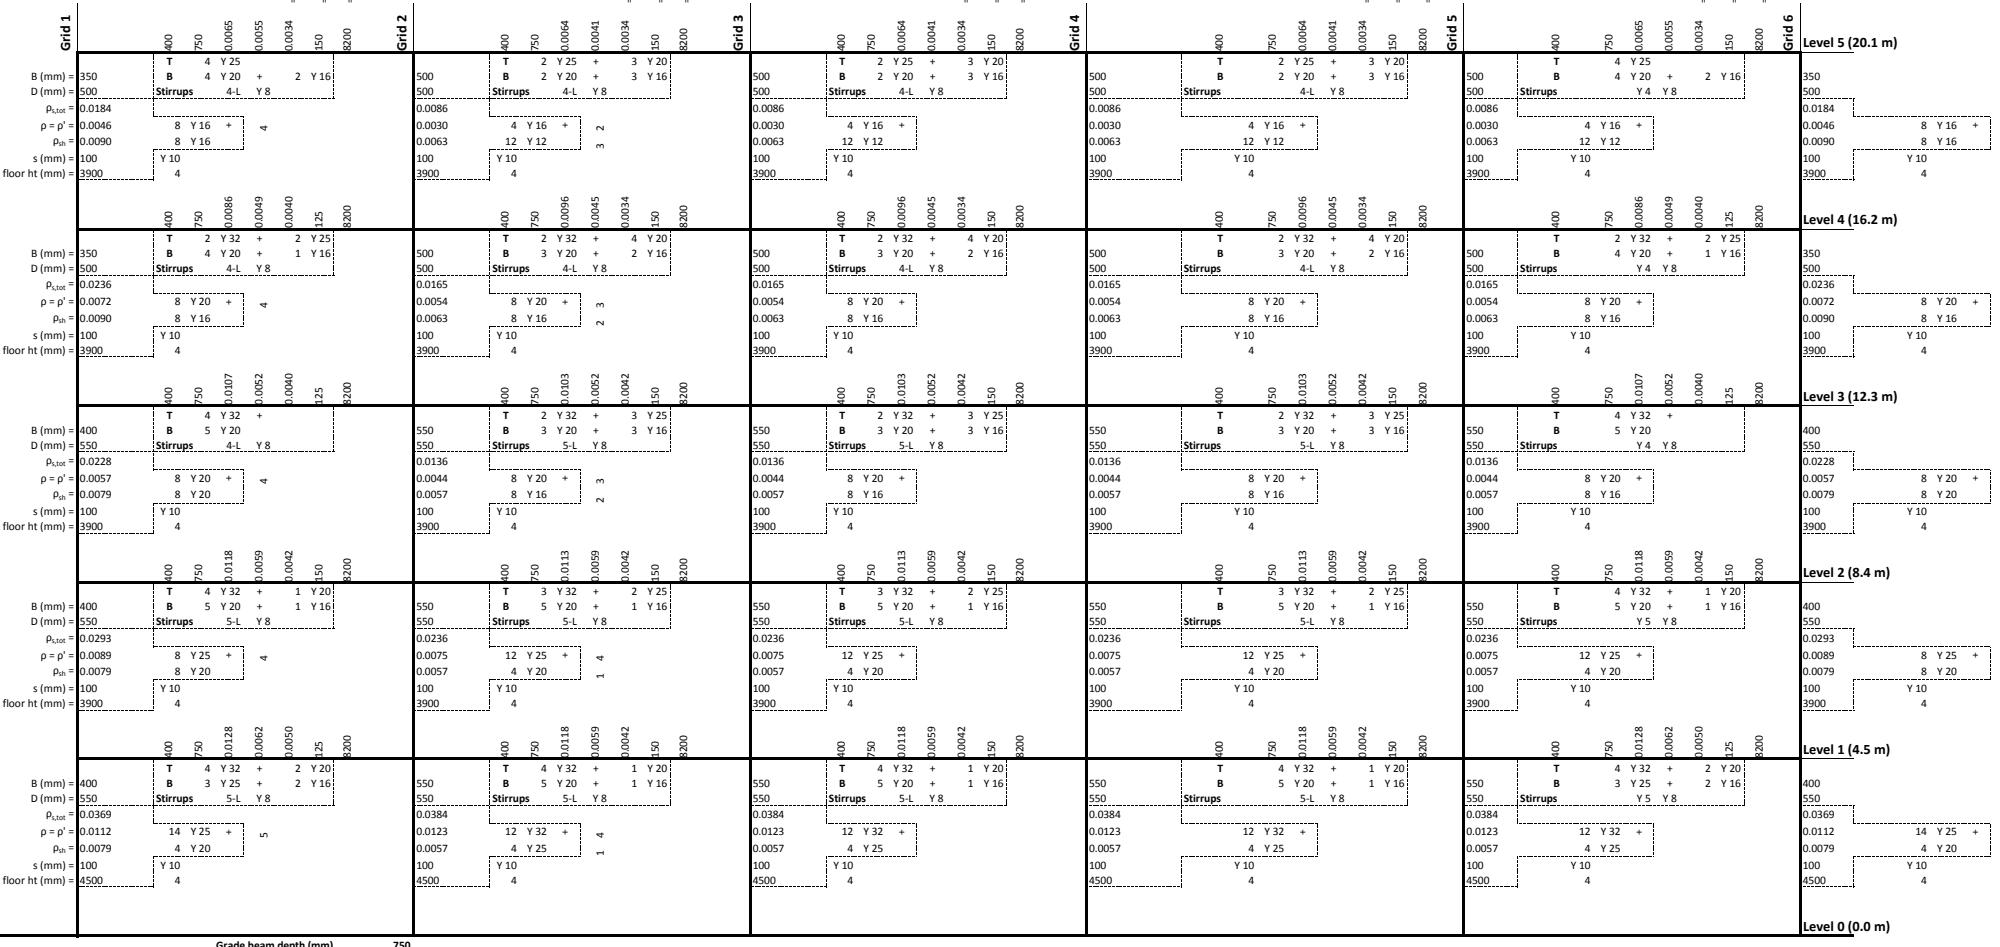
Provided reinforcement and modeling details for building ID 2437
